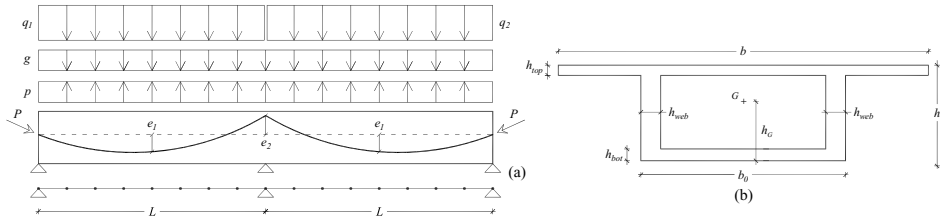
Box girder bridge undergoing damage. (a) Structural scheme and loading conditions. (b) Geometry of the box cross-section.
